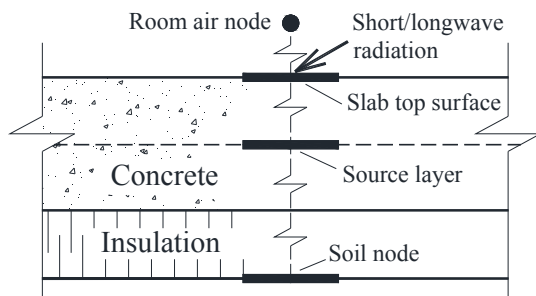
Thermal network of an active BITES floor with its cross section transformed
